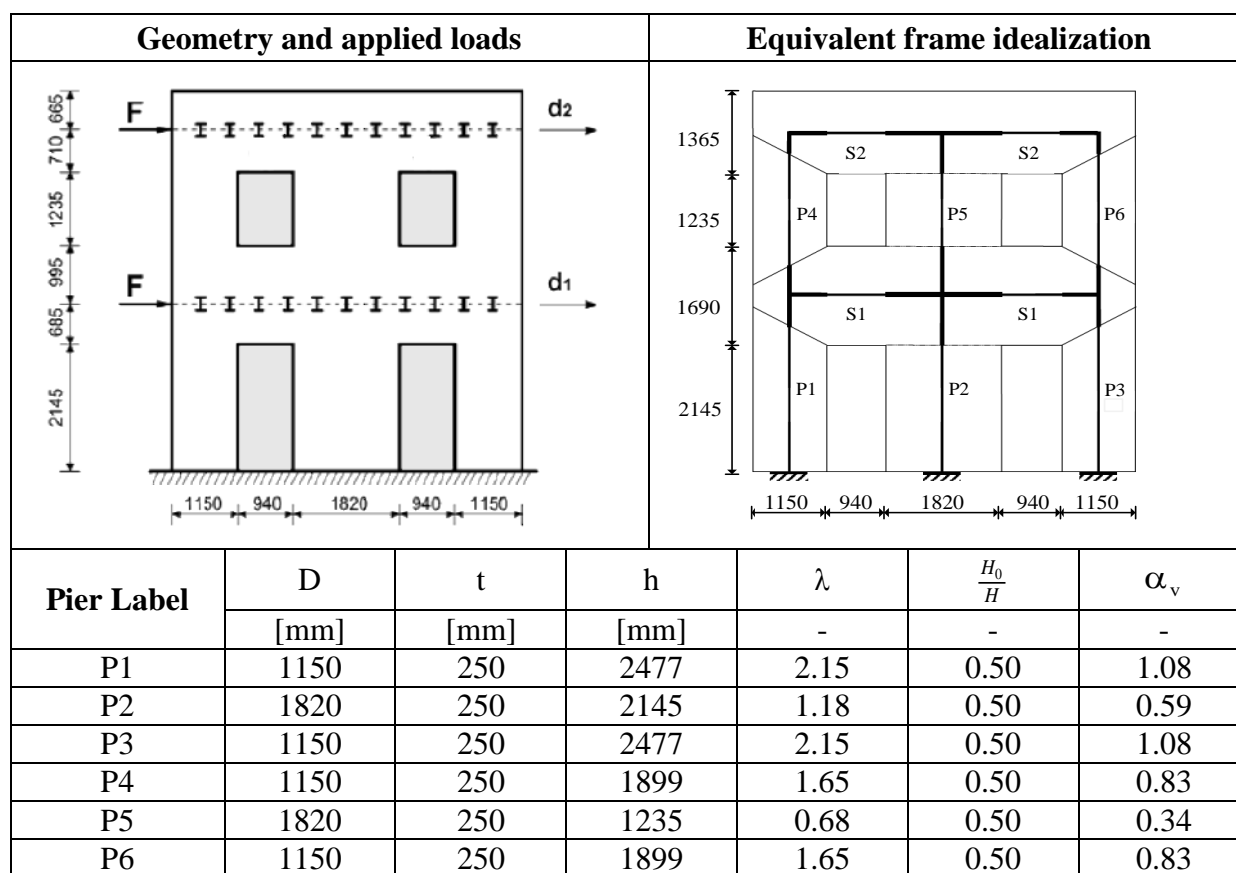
Geometry and applied loads (a) and equivalent frame idealization of the door wall (b); pier height determination according to Dolce (1989) for the Pavia door wall (Demirel, 2010).
